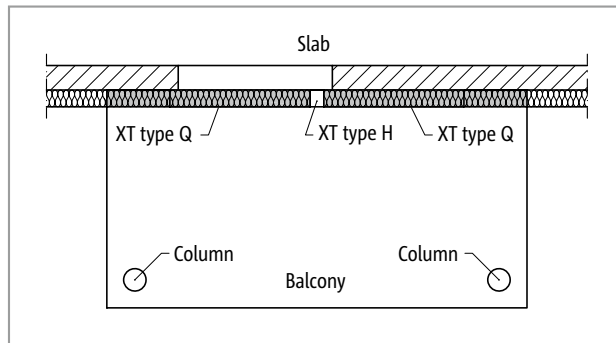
Schöck Isokorb® XT type Q: Balcony with column support
